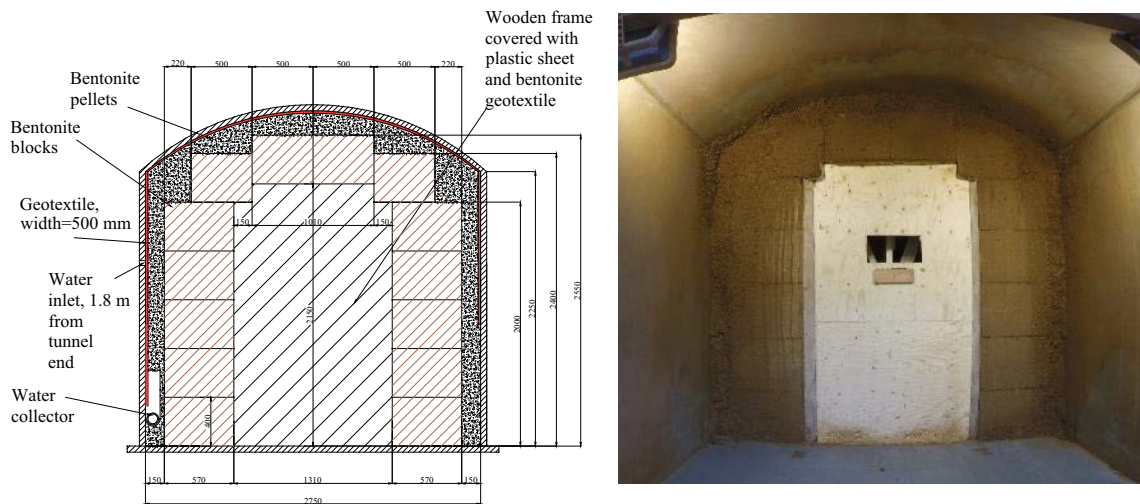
Steel tunnel equipment used in the half scale tests. The drawing and photo show the test setup used in the last test performed within KBP1011.
